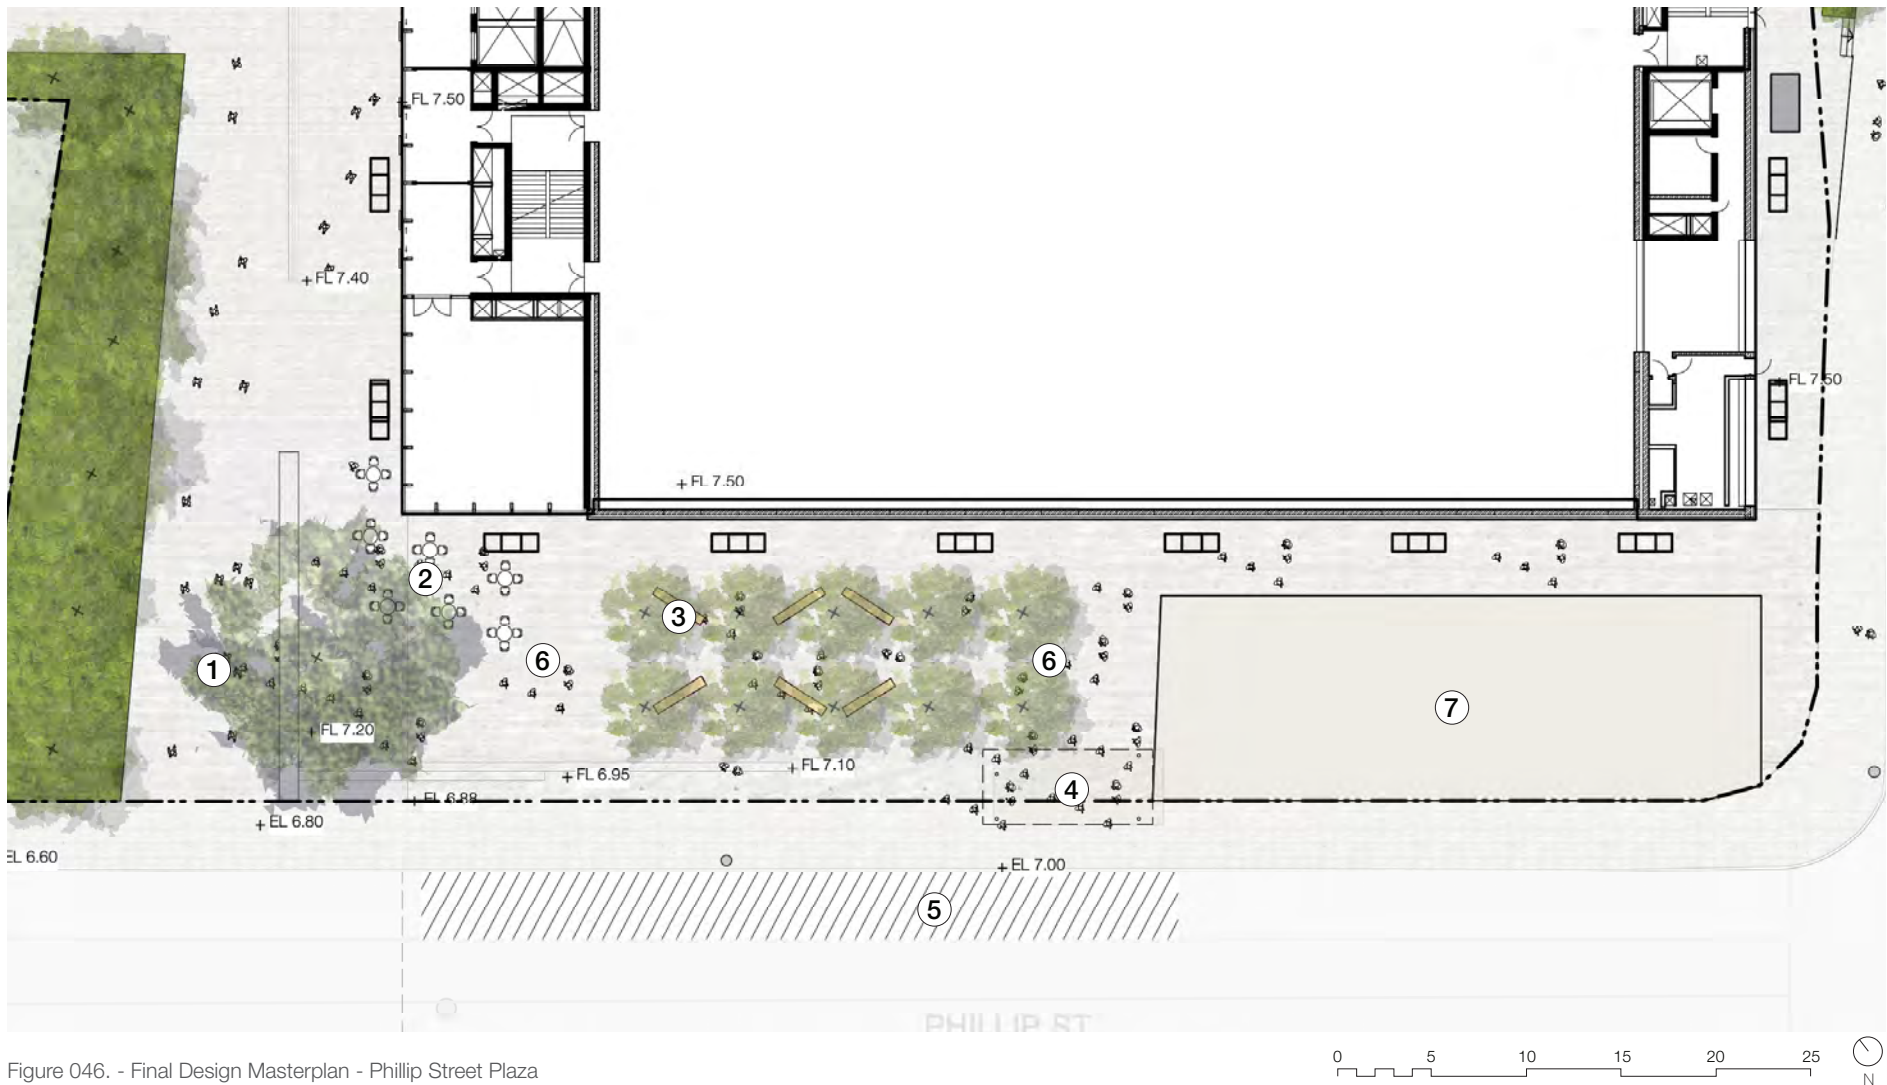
Final Design Masterplan - Phillip Street Plaza
